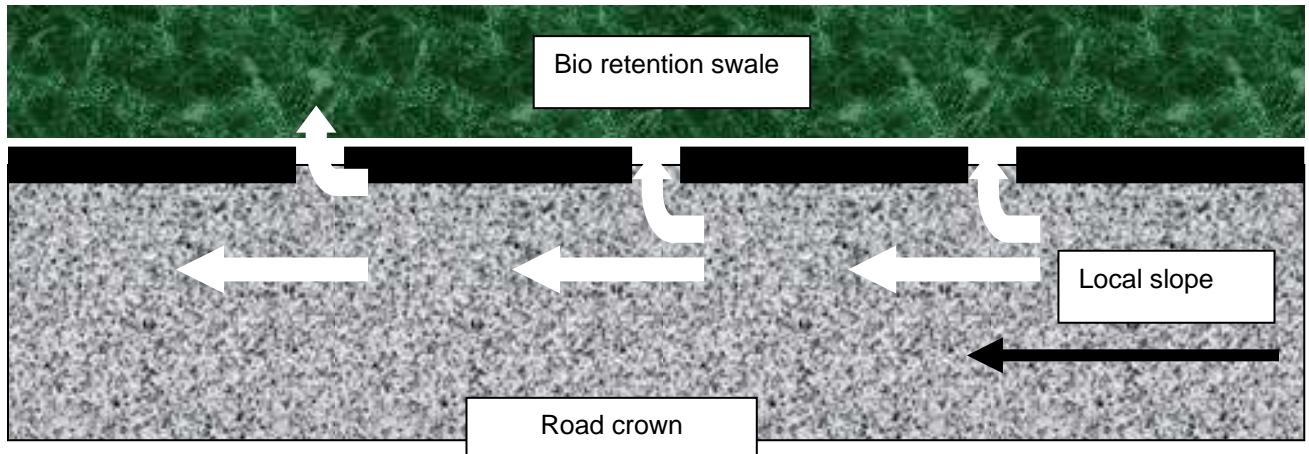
Inflow arrangements to the planted area. There are 500 mm long concrete stops with 50 to 70 mm gaps between each one.
